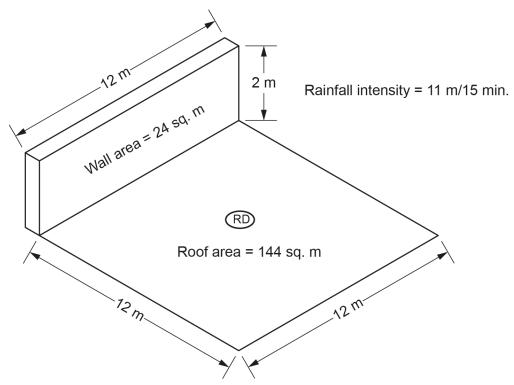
Flat roof with vertical adjoining wall. (Skilled Trades BC, 2021) Used with permission.
